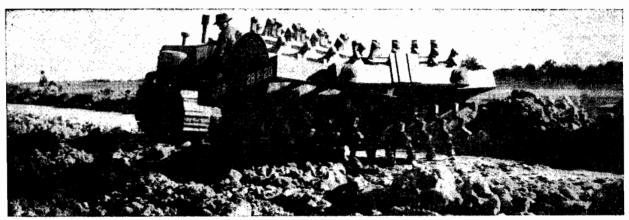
A sheep's foot roller at work on the Loddon Valley Highway south of Kerang, compacting soft sandstone.
